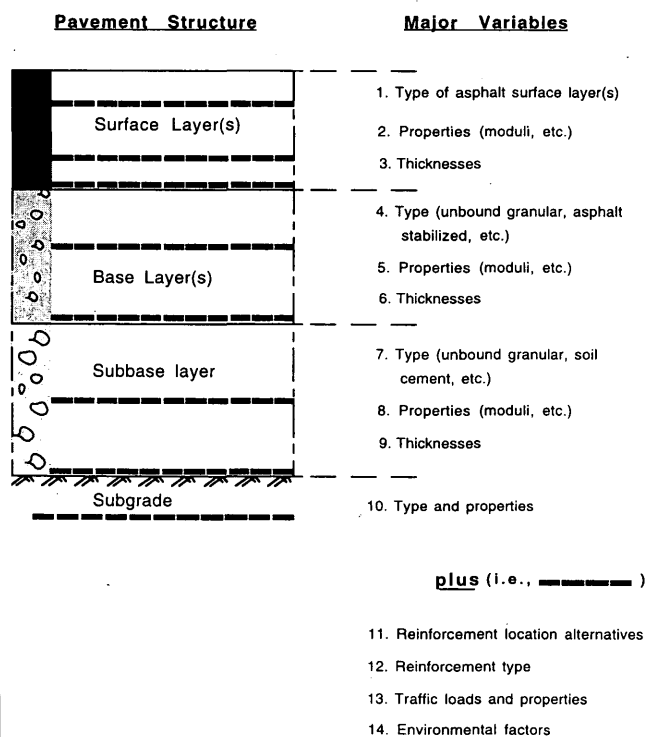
Reinforcement location alternatives and some of the major variables.
